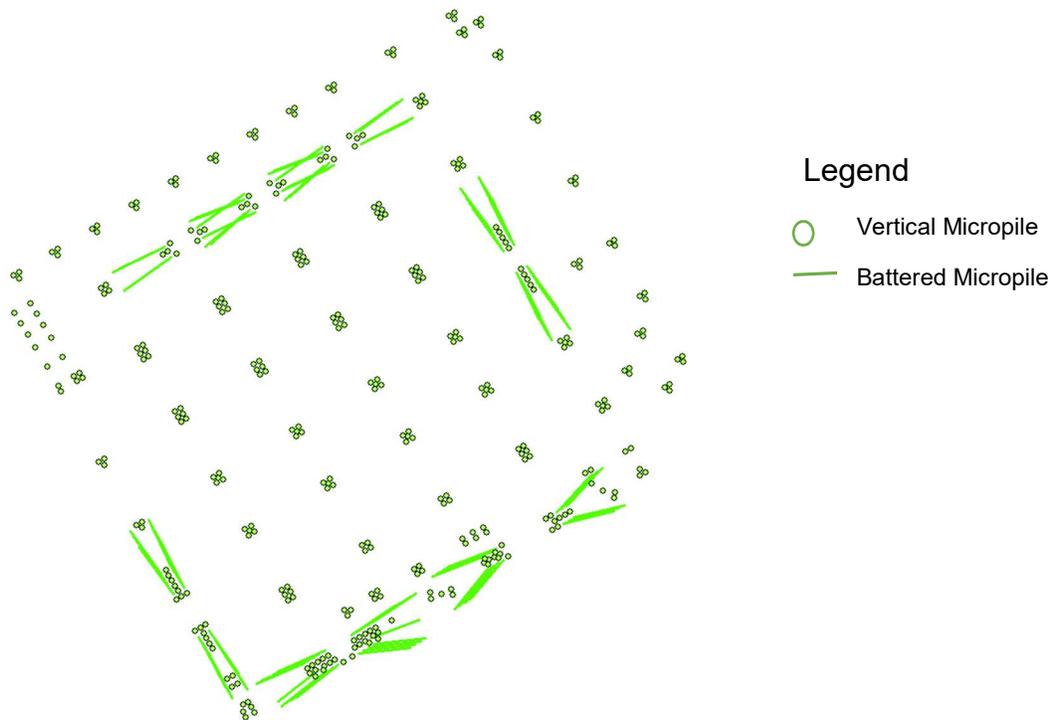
Revised pile layout with 1 to 2 piles removed per pile cap.
